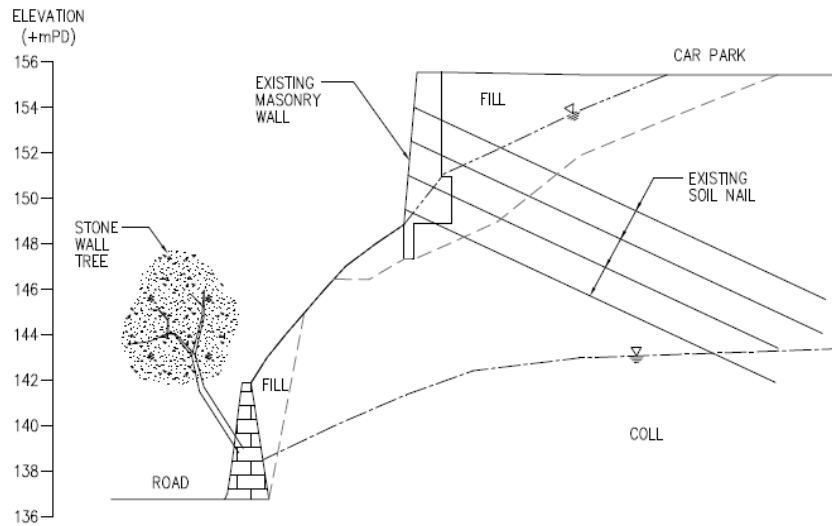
Typical section of the cut slope with retaining wall before upgrading work
